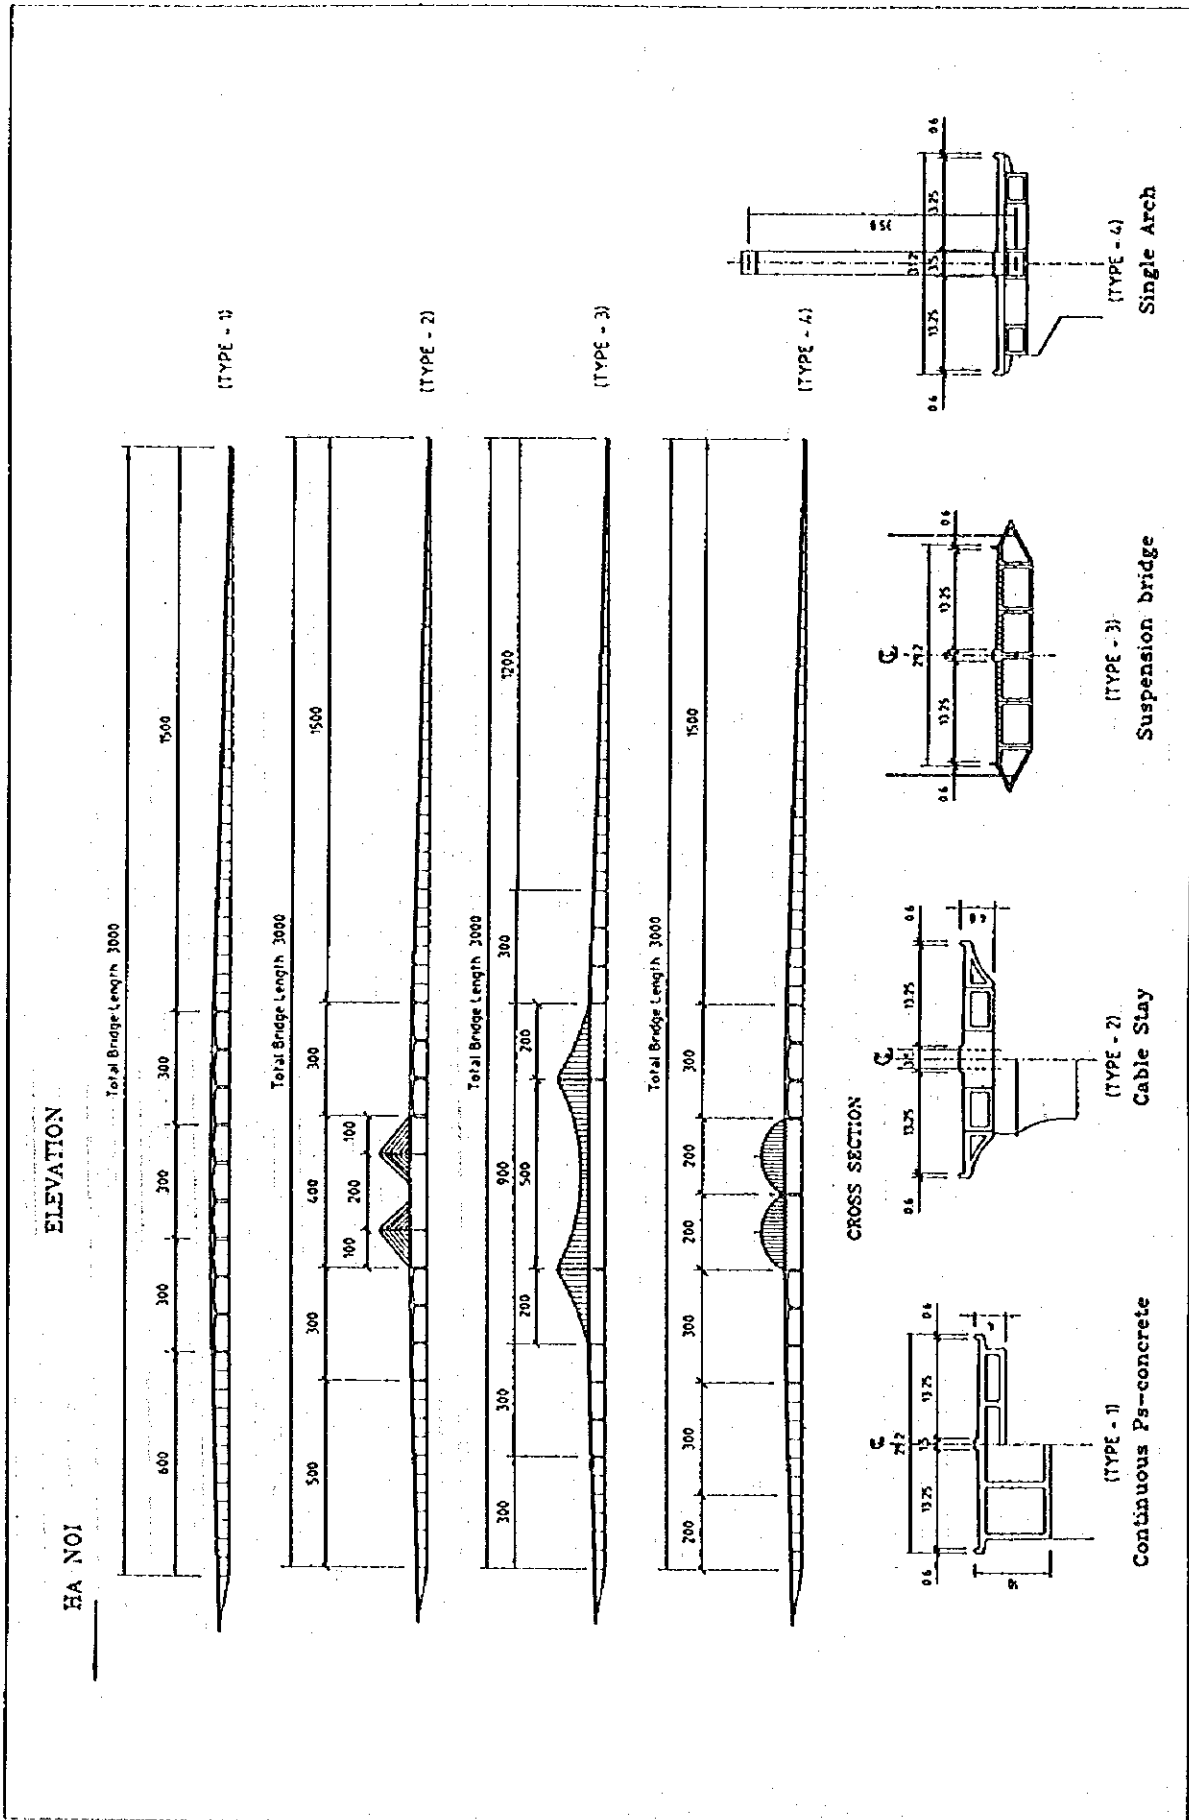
Thanh Tri Bridge Type and Cross Sections
